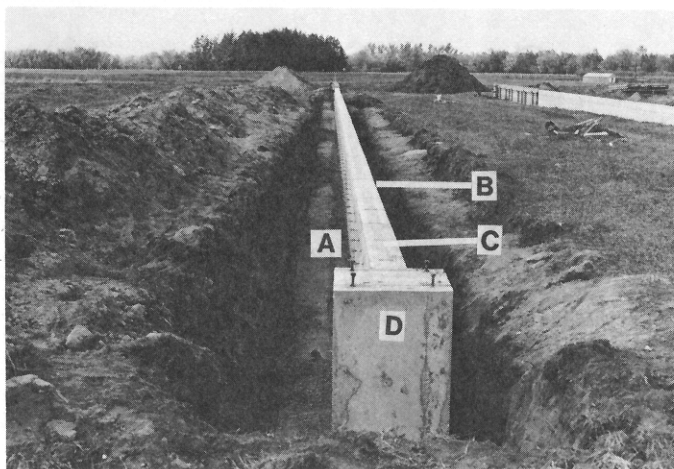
Foundation for rainout shelter. (A-footing; B-wall; C-T iron, and D-pillar)
